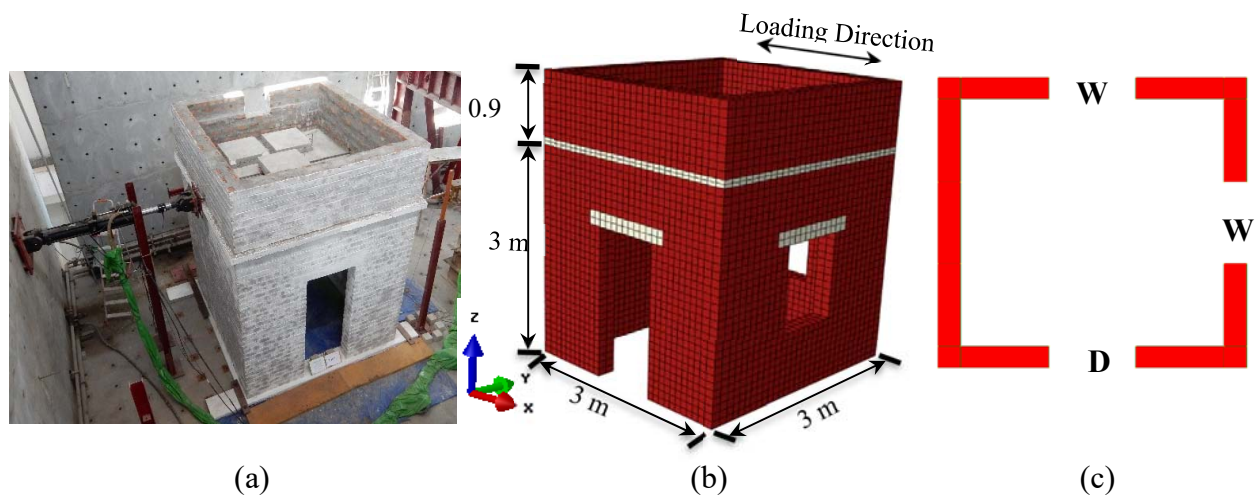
(a) URM building test specimen (b) FE Model and (c) Building Plan
